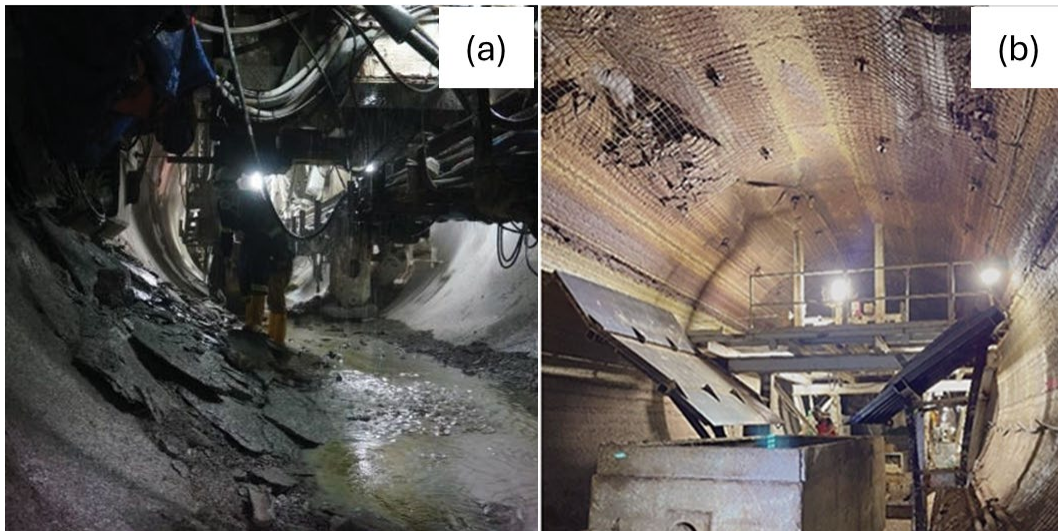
Brittle failure challenges were encountered at (a) the long-distance water transfer TBM excavation (Kawata et al., 2014) and (b) the Ohio River Tunnel Project in Louisville, KY (des Rivières and Goodman, 2023). Both brittle failures encountered at the tunnel wall caused nuisances to the project and demanded additional efforts to ensure the safety of the personnel.
